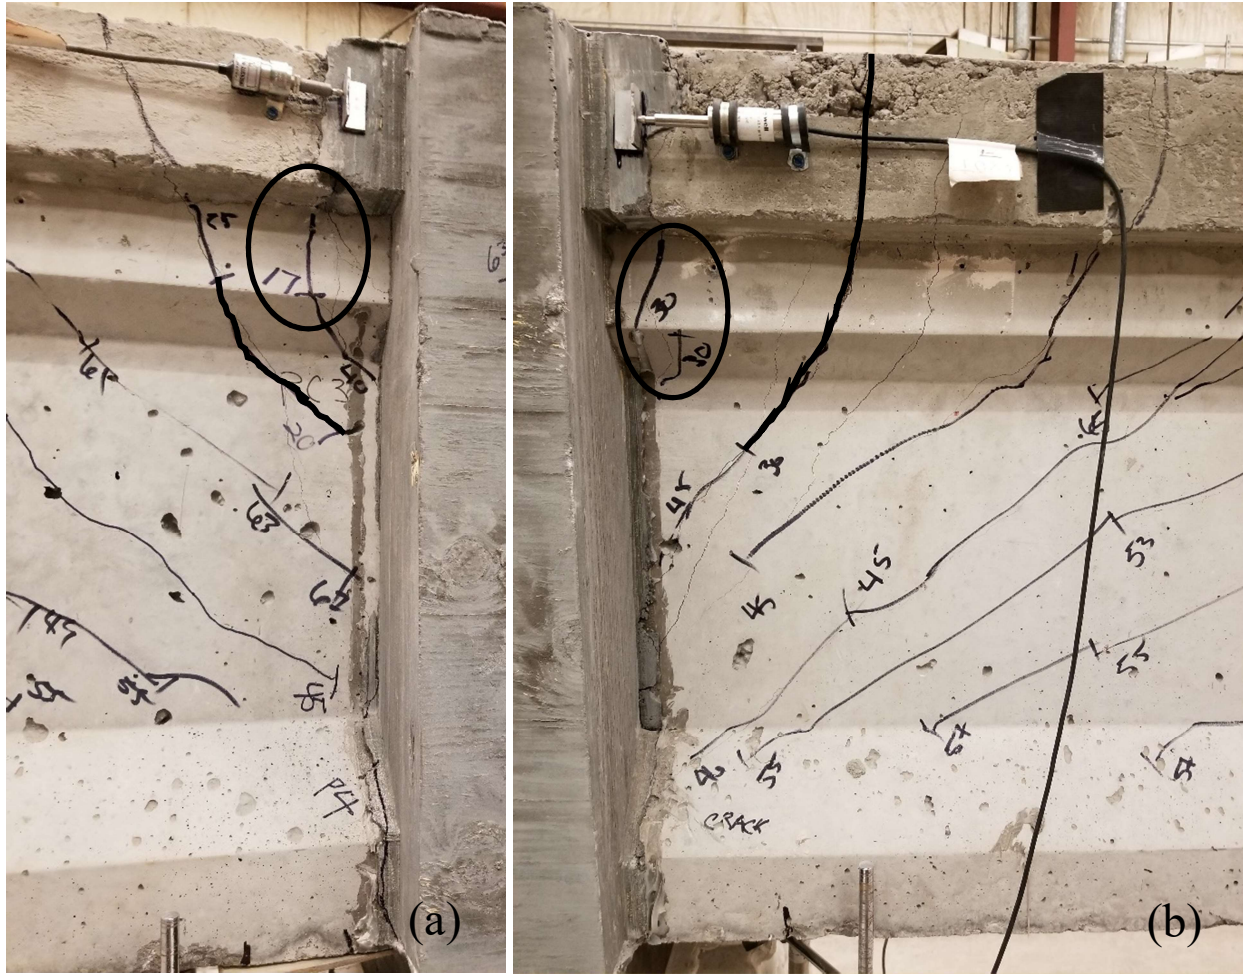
Initial flexural cracking on the RC3-N girder at 17 kips of load and initial flexure-shear cracking on the RC3-N girder at 20 kips of load (a) and initial flexural cracking on the RC3-S girder at 30 kips of load and flexure-shear cracking on the RC3-S girder at 30 kips of load (b). Dark ovals show the initial flexural cracking near the continuity joint and arrows point to the dark lines that indicate the initial flexure-shear cracking.
